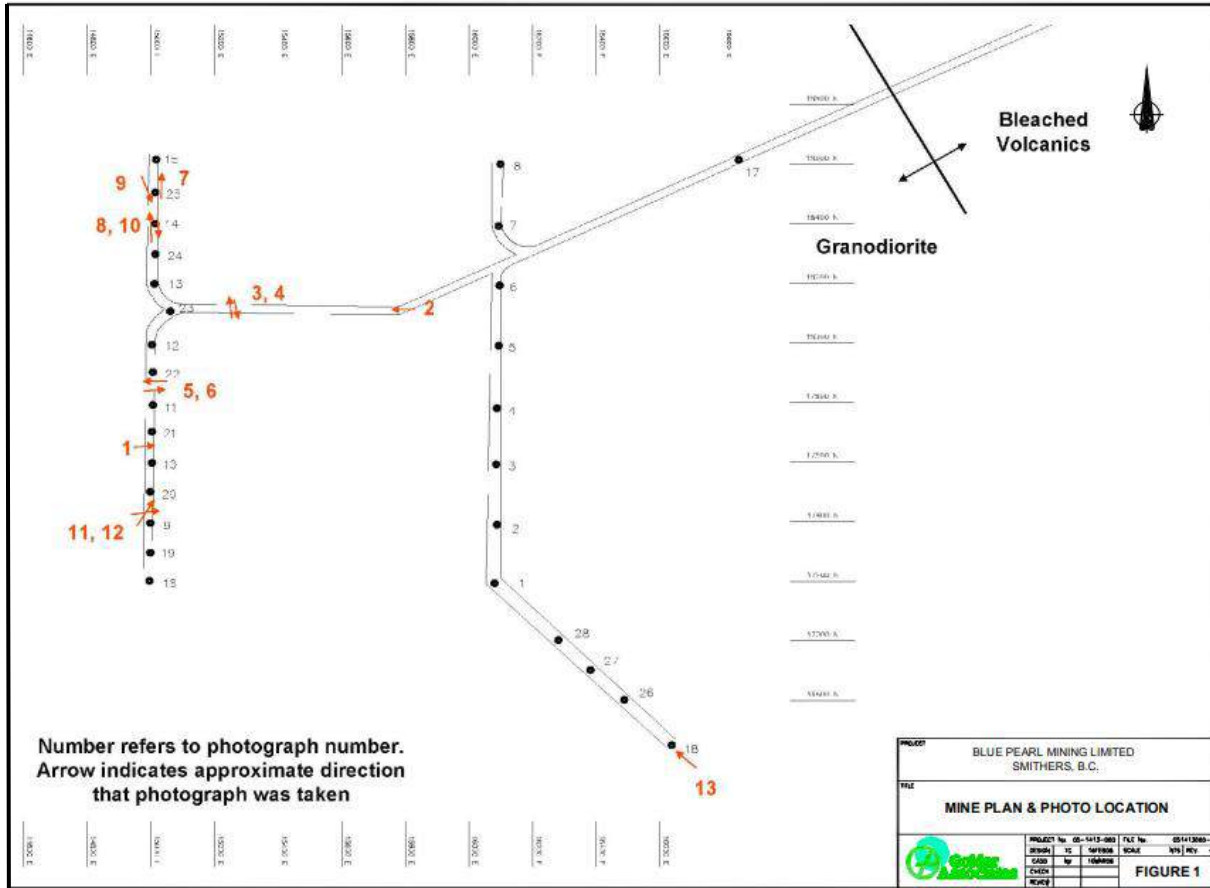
Detailed plan of exploration adit layout. Numbered black dots are drill stations (After Golder, 2006)
